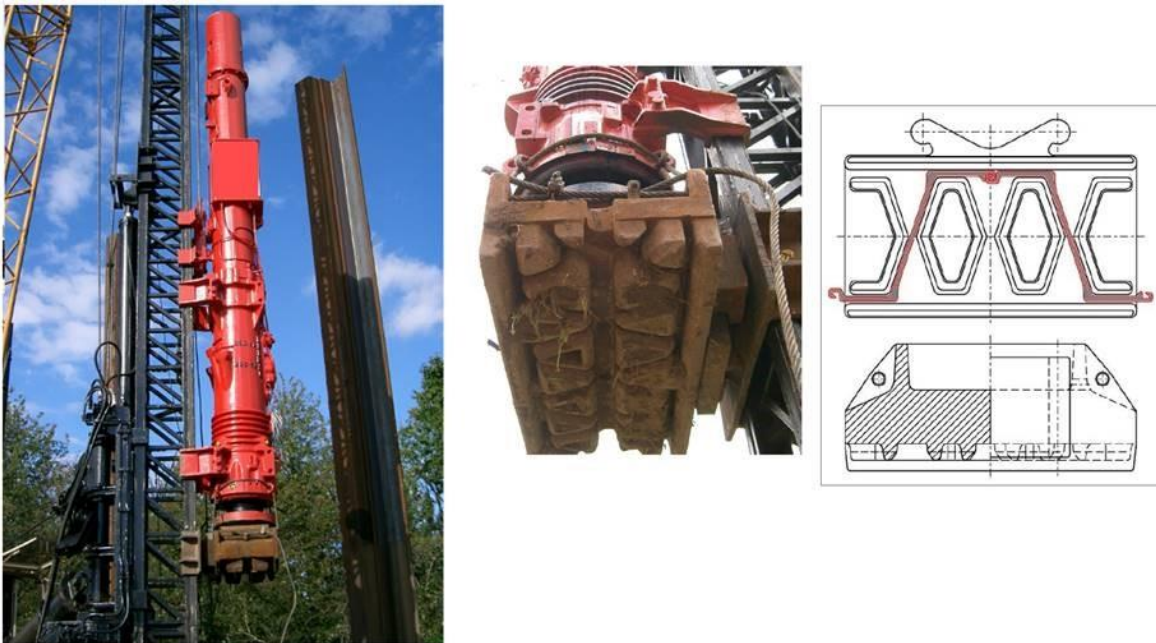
A helmet used for driving a full-scale sheet pile in the field; photo courtesy of GRL Engineers, Inc.
